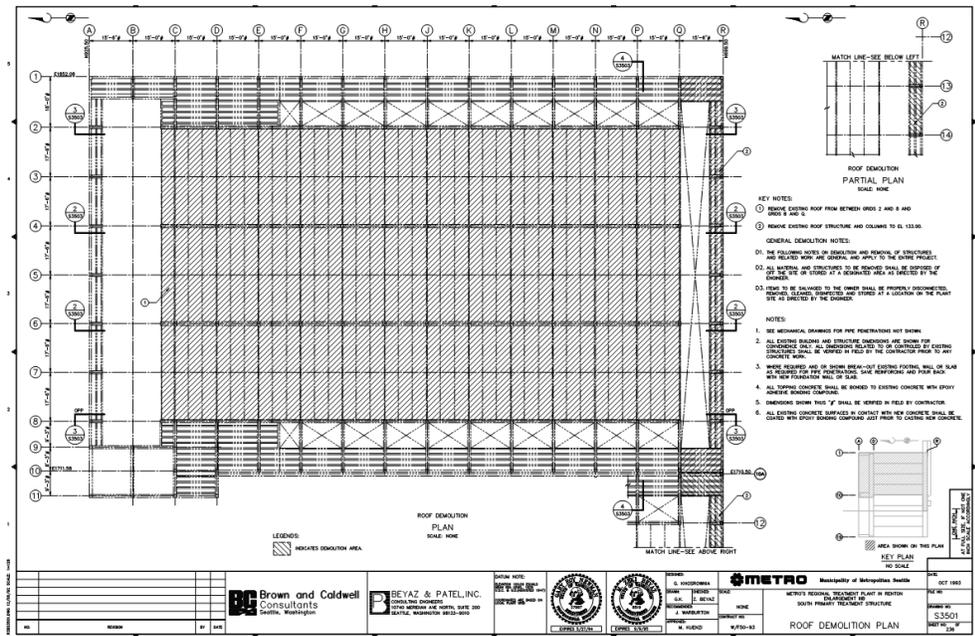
Roof Demolition Plan – South Plant Sedimentation Basin
